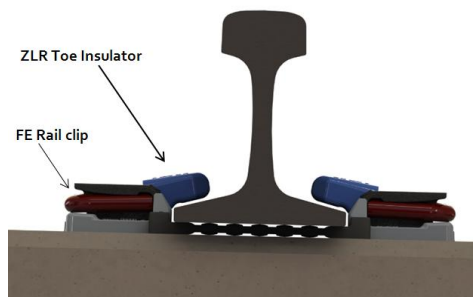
Pandrol ZLR fastening systems with the gap under toe insulator and foot of rail
